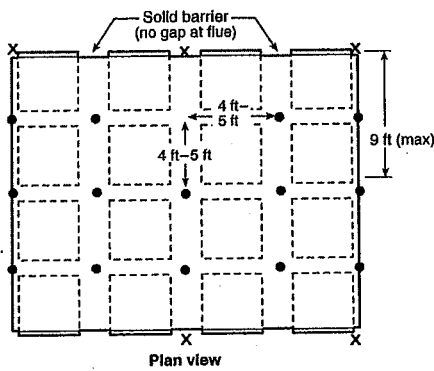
(a) Single-Row Rack Sprinkler Layout for Design Scheme "C." [30: Figure 16.6.3.1(a)]
